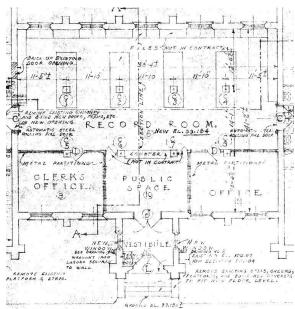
, Fredericksburg Courthouse, Detail, central portion of first floor. J. Binford Walford & O. Pendleton Wright, Renovation drawings, 1948. Courtesy City of Fredericksburg.
